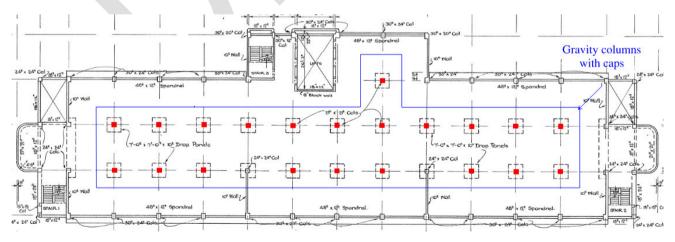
Internal gravity columns with caps (No internal beams - flat slab)
